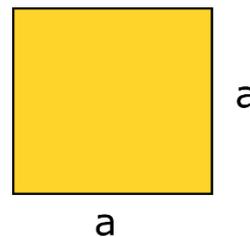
Definition of height and width, “a” for wooden beams with a square cross section
